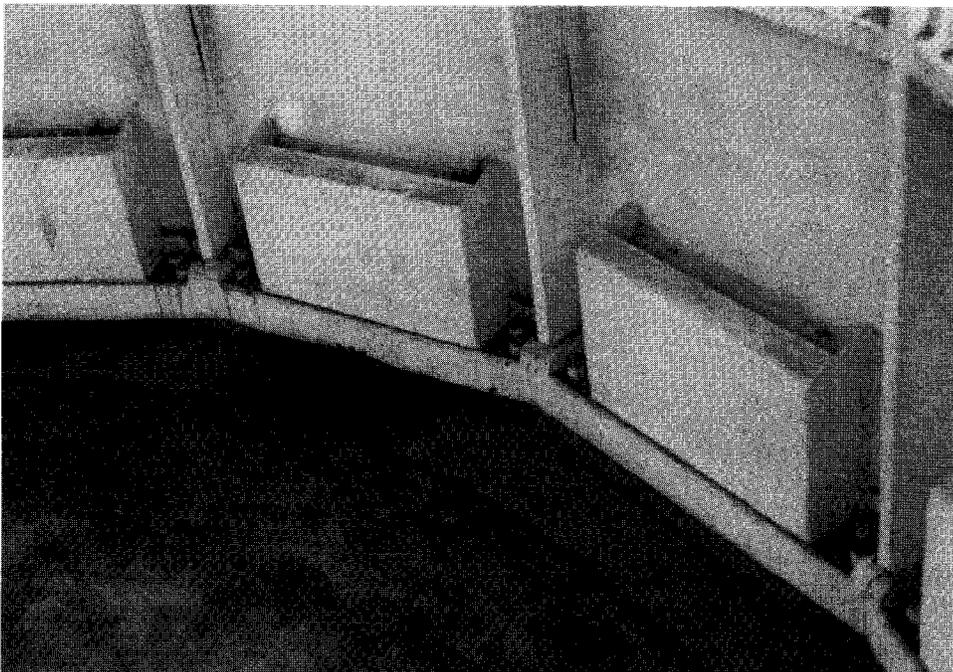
Room 112, vent covers at base of Lantern Deck window wall.
